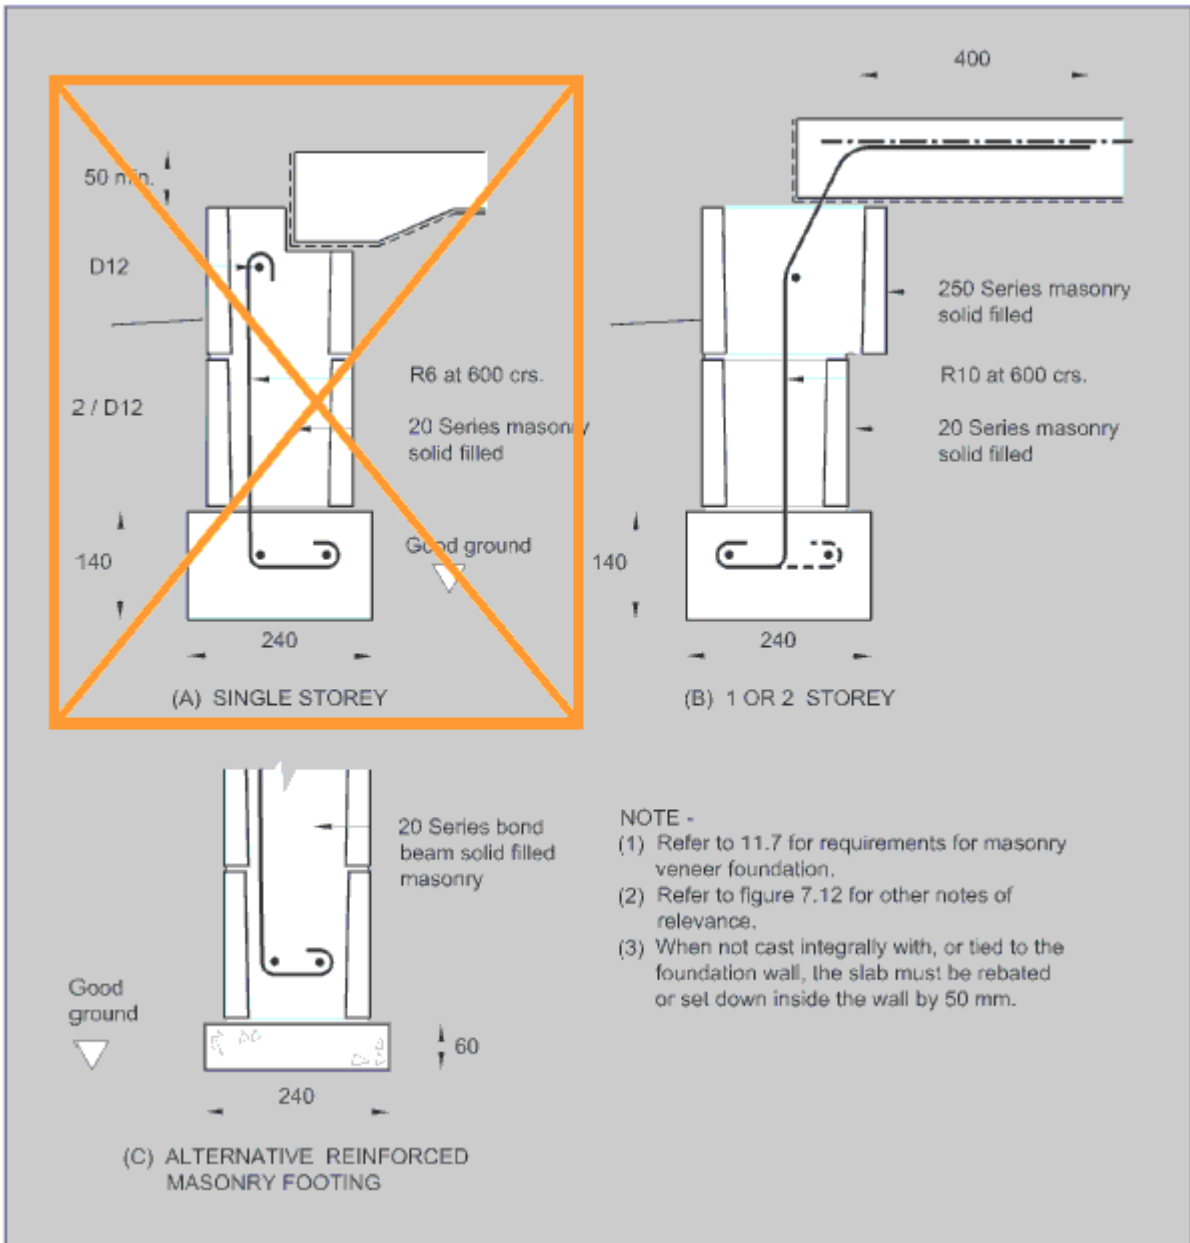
Masonry veneer foundation edge details - Concrete masonry -
